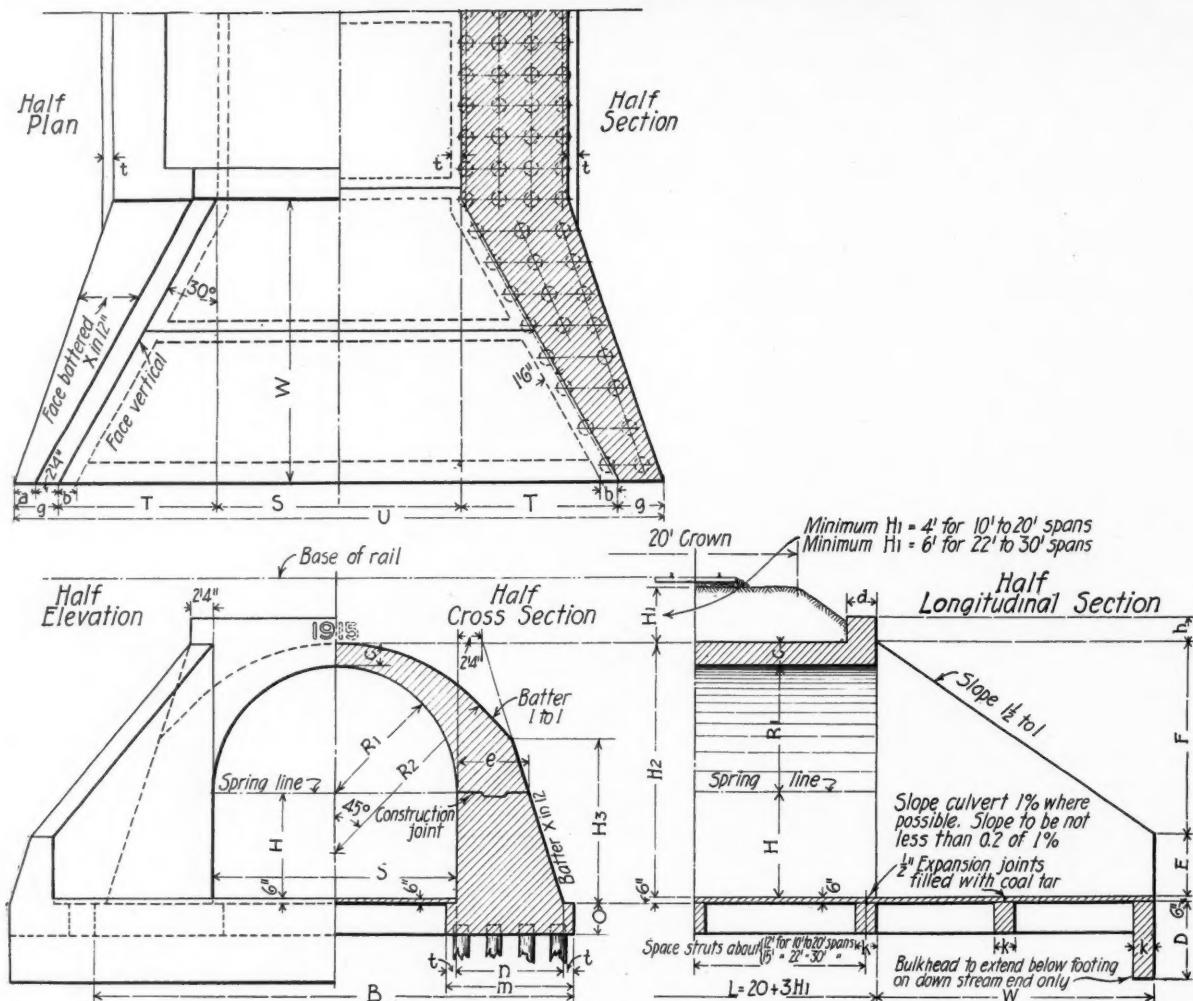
Detail Plan for Standard Plain Concrete Arch Culverts, St. L. &amp; S. F. R. R.
